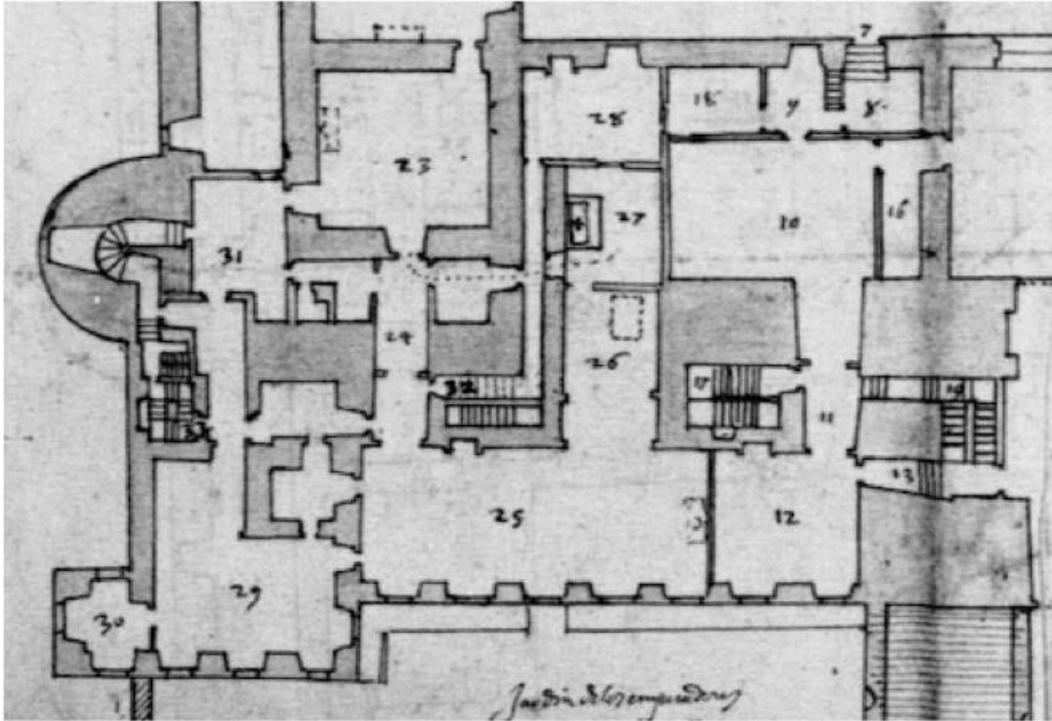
Juan Gómez de Mora, Plan of the Second Story of the Alcázar of Madrid (“Planta Baja”) (detail). 1626, Vatican Library, “Galería del Príncipe”: nos. 25 and 12.
